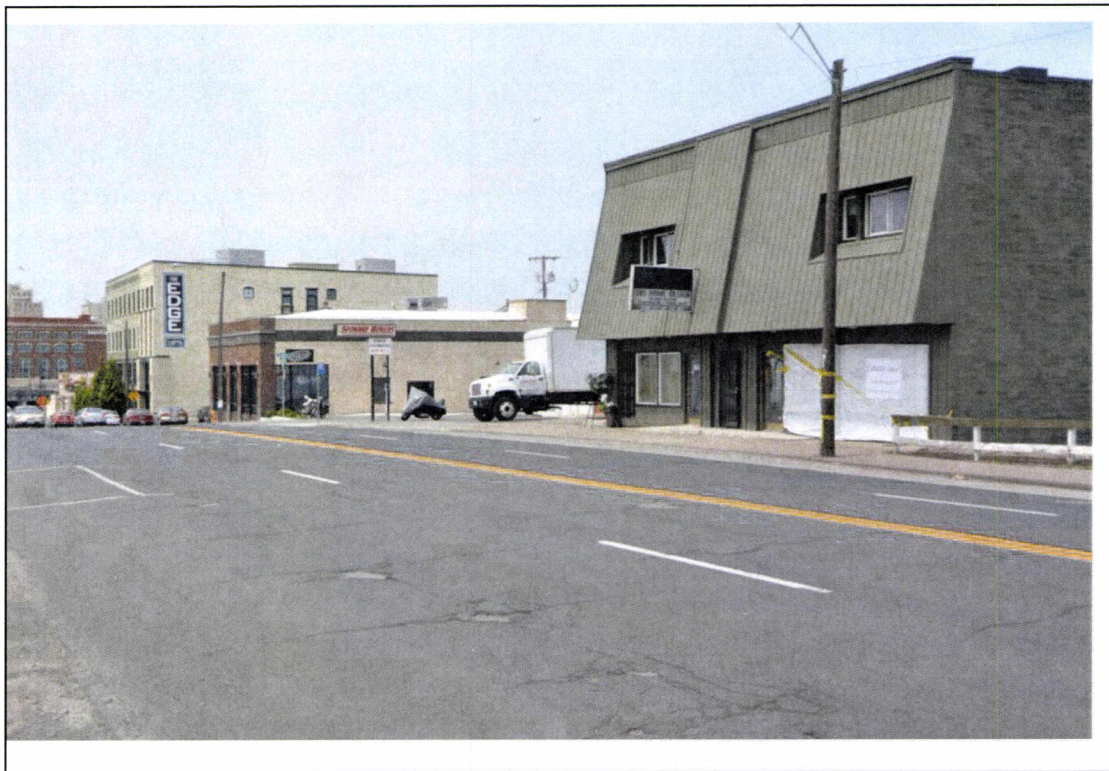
View to Northwest Showing Context Along Sprague Avenue
